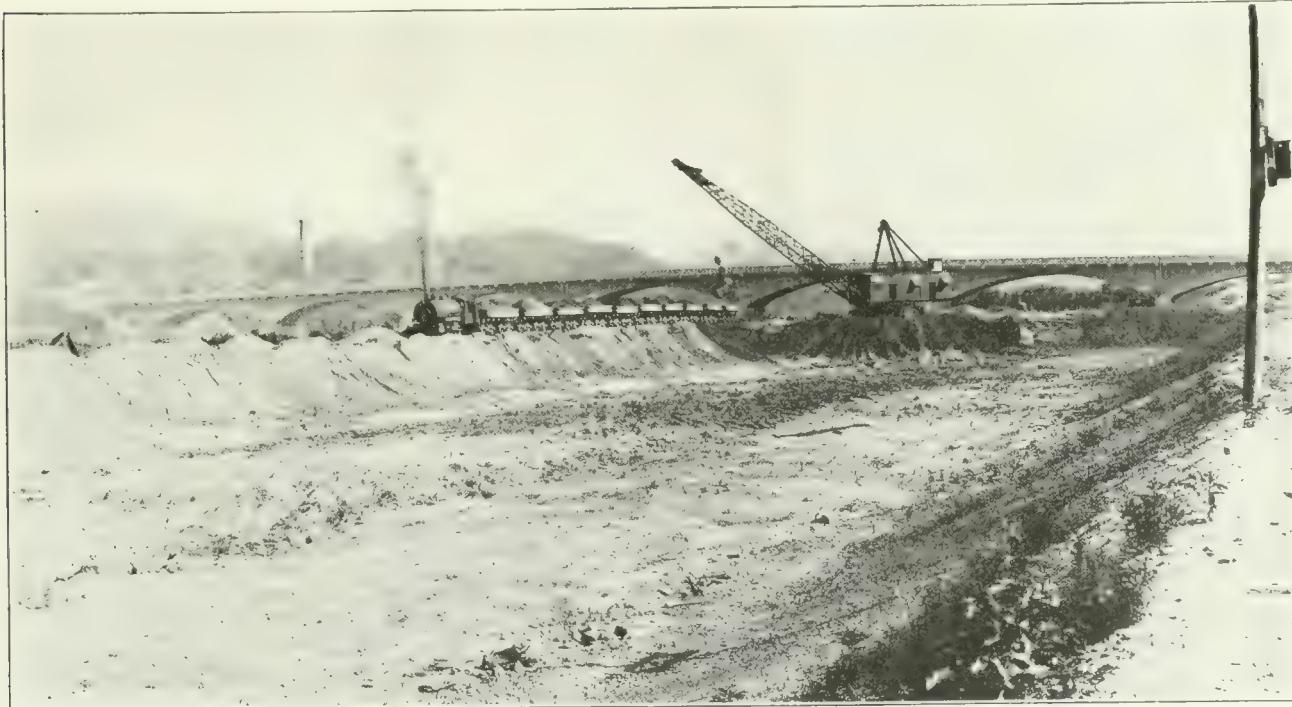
EXCAVATING IMPROVED MIAMI RIVER CHANNEL BELOW COLUMBIA BRIDGE, HAMILTON
